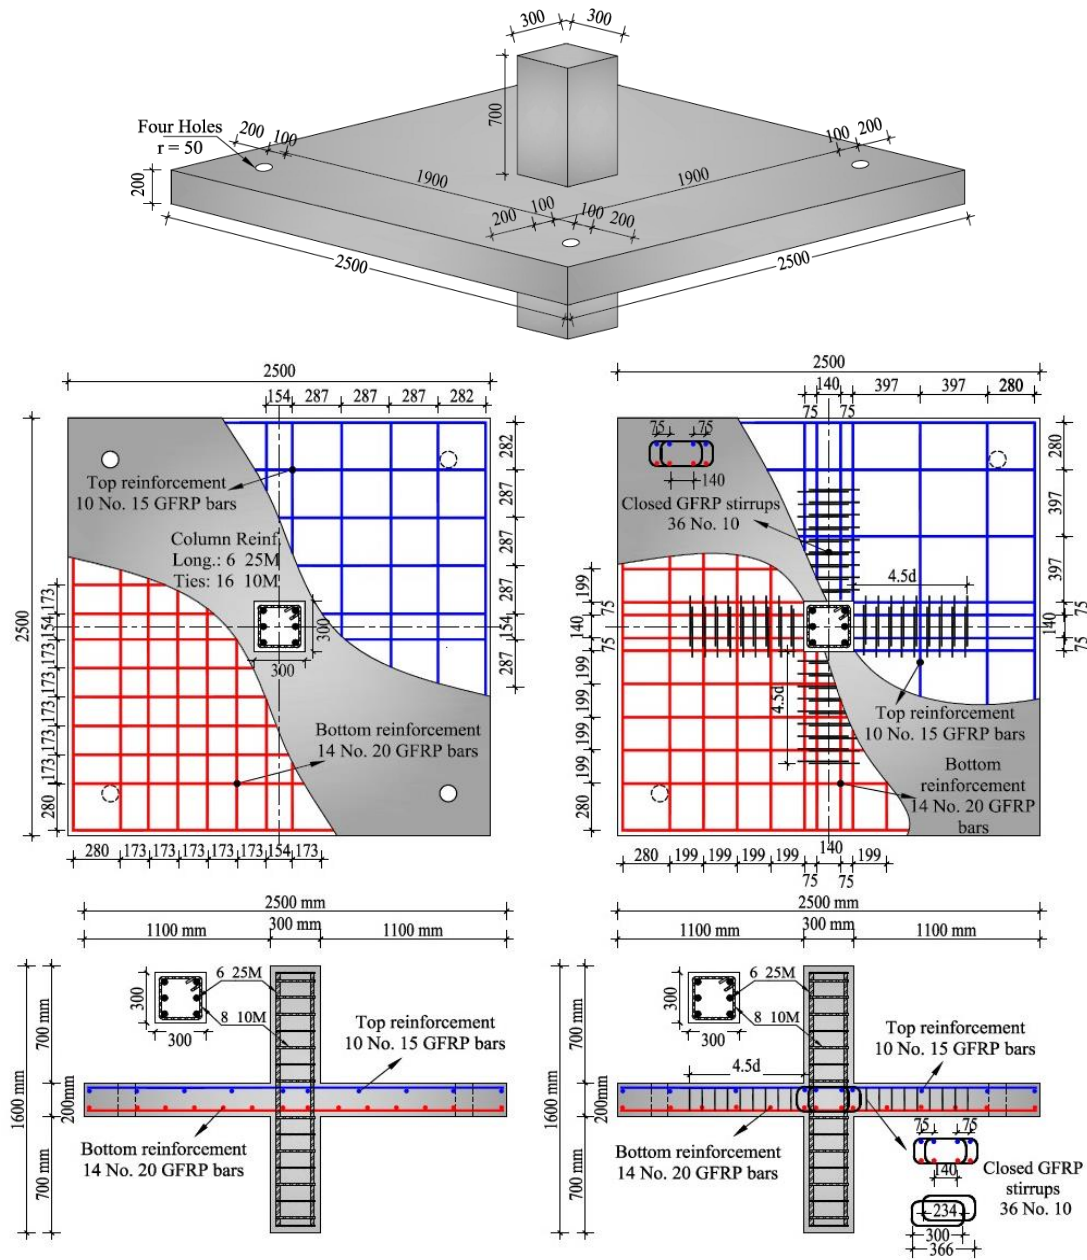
Typical geometry and reinforcement details for the tested specimens.
